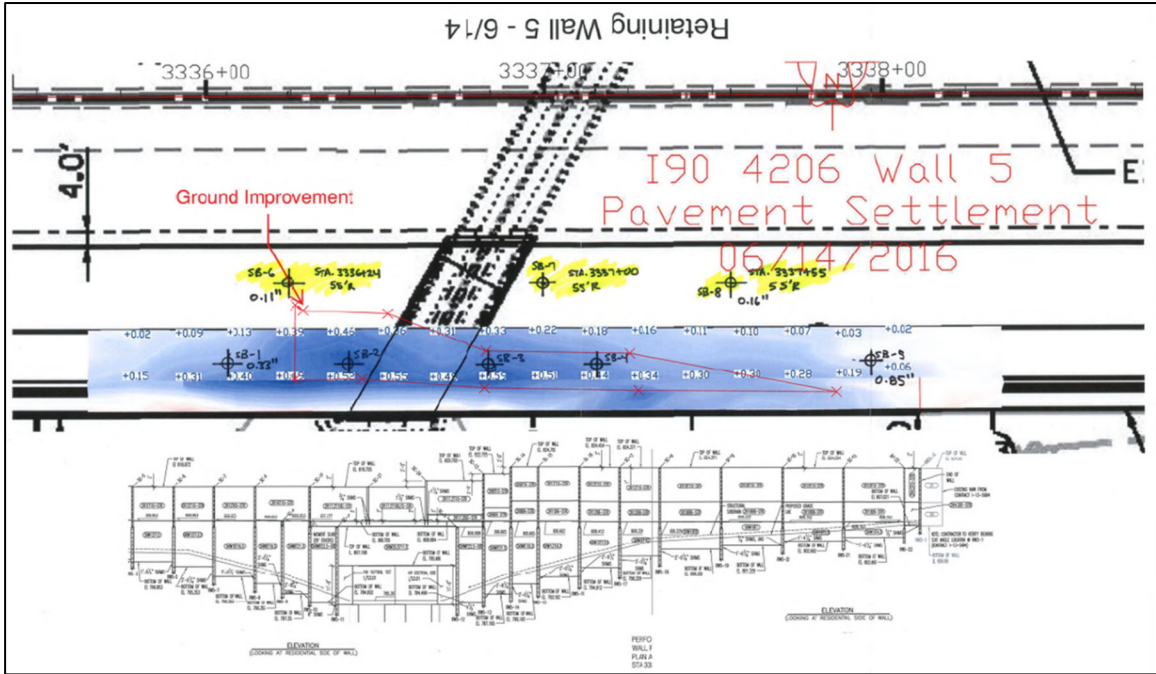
Failure locations next to Retaining Wall #5 (Station 3336+00).
